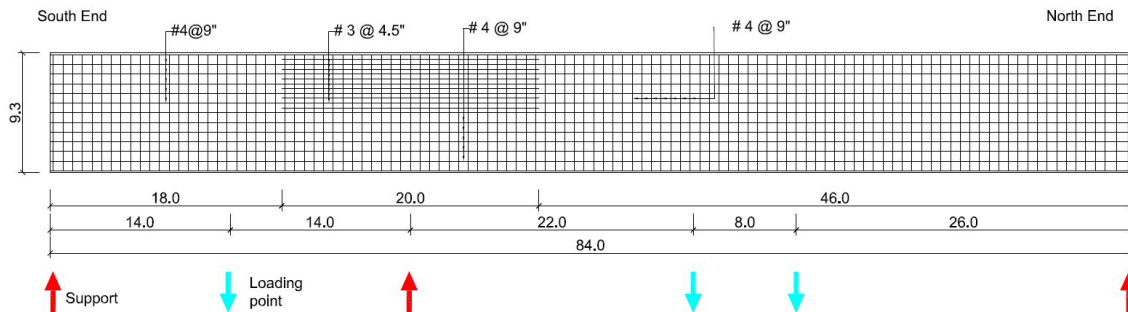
9 Deck Reinforcing Steel Layout in Tub 3
